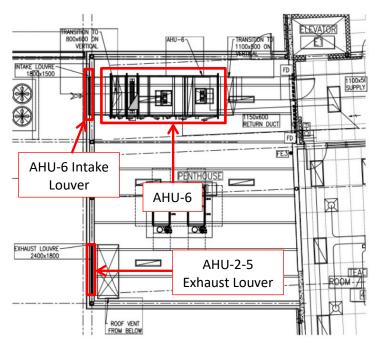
Fourth floor mechanical penthouse plan showing location of considered equipment.
